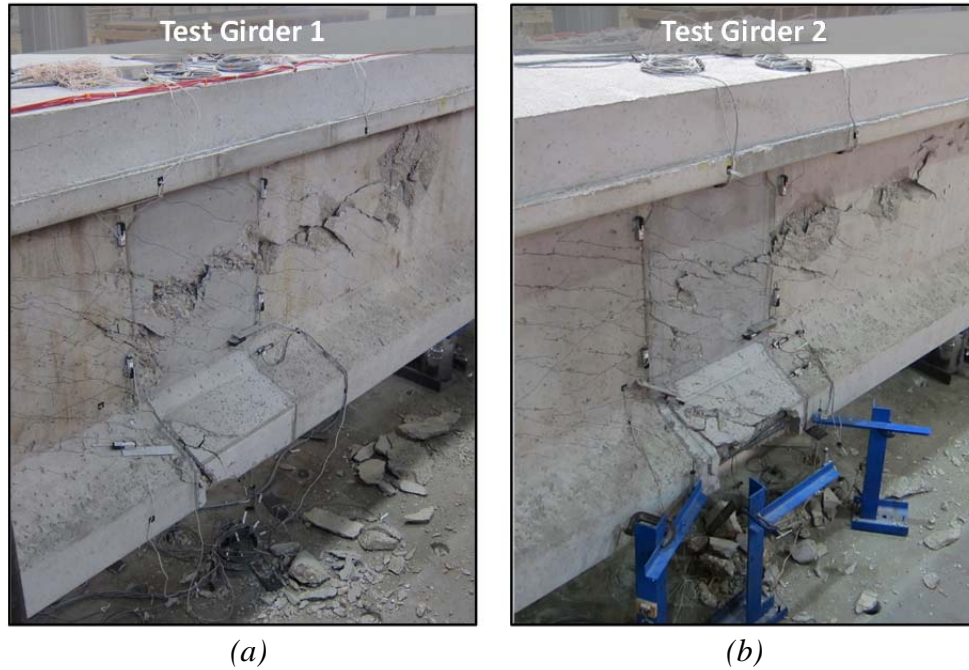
Test girders after failure – (a) Test Girder 1; (b) Test Girder 2
